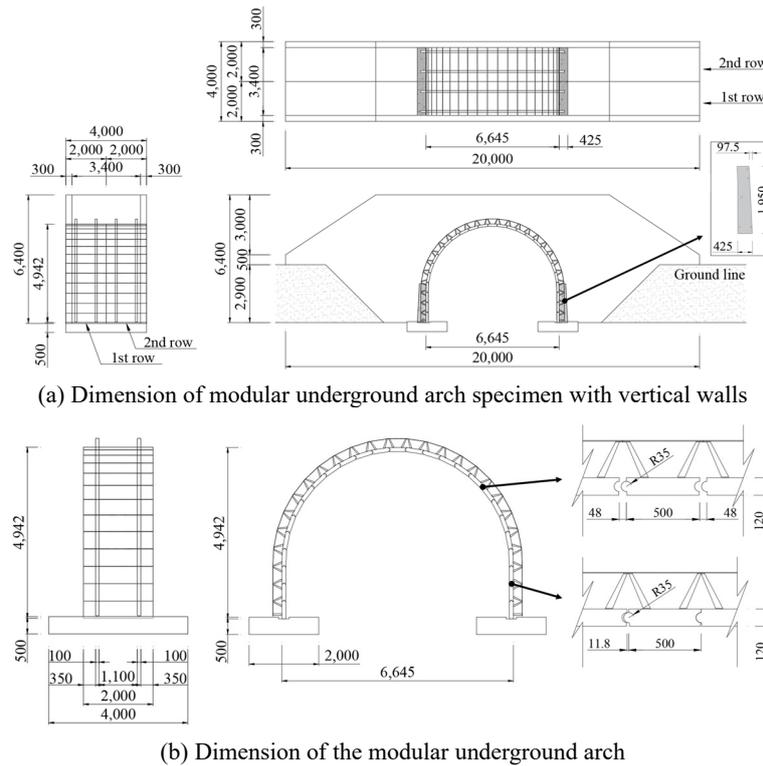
Detail of modular underground arch culvert specimen (unit: mm)
